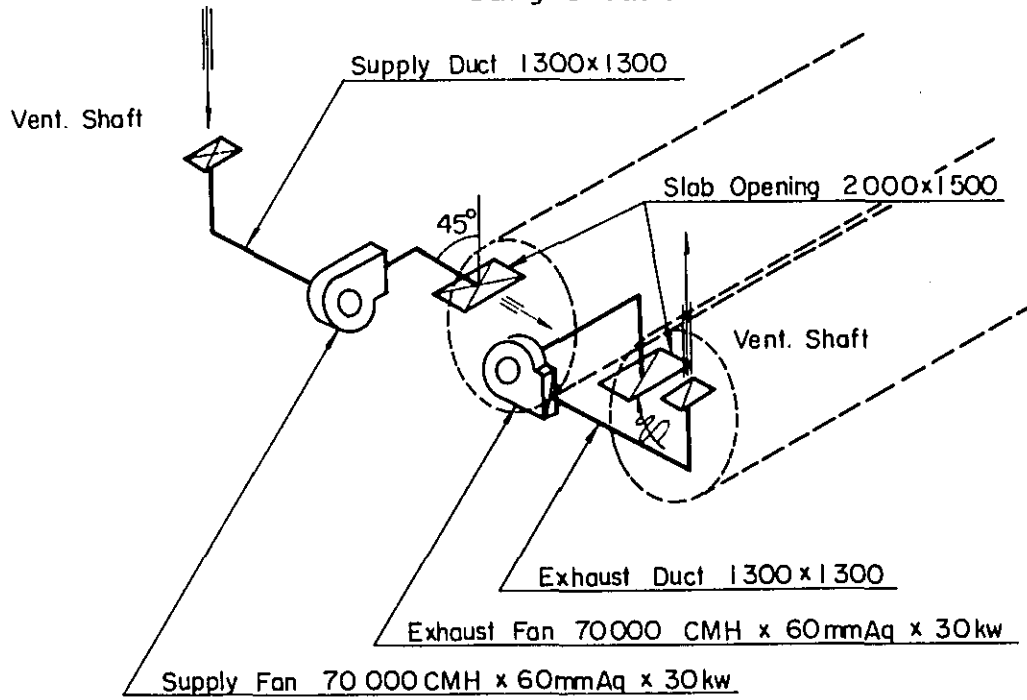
Ventilation Duct System for Double Line Rock Tunnel
